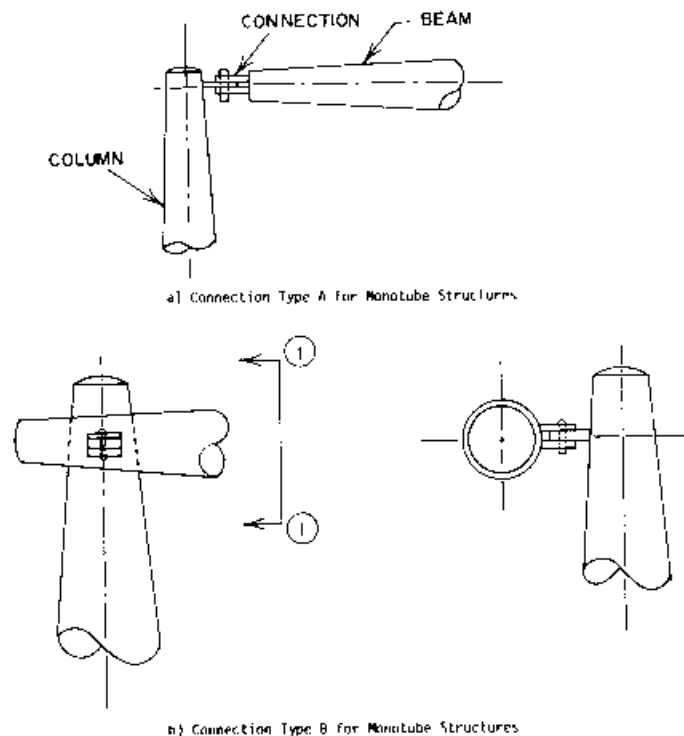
Some Typical Beam-to-Column Connection Details for Monotube Structures: (a) Connection Type A; (b) Connection Type B
